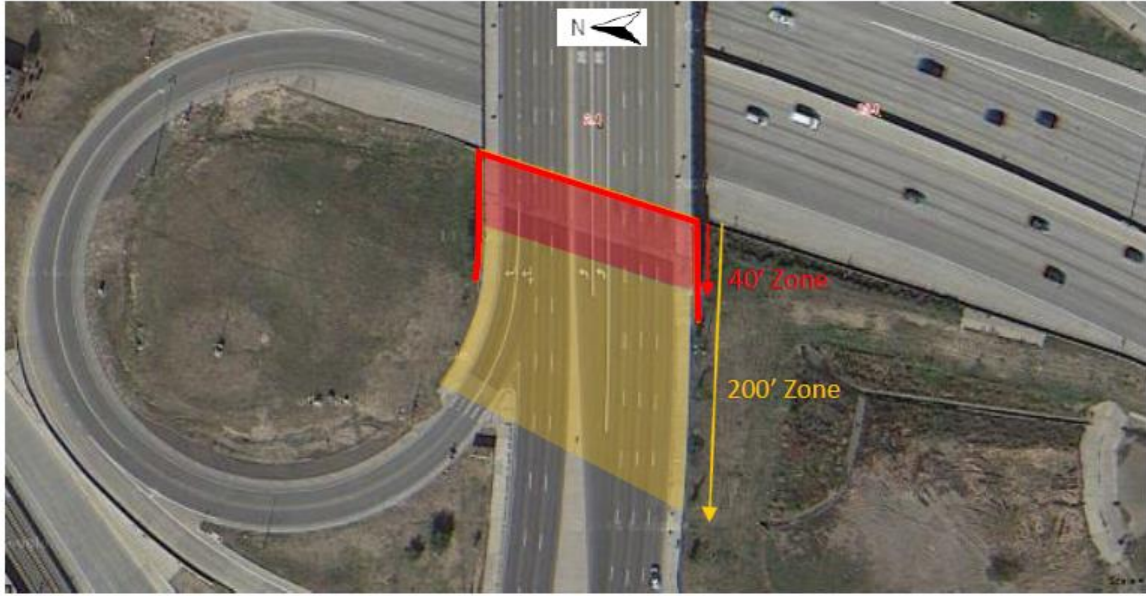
Photo. Bridge wall zone, scenario 01 ([Walters et al., 2016](#)).
